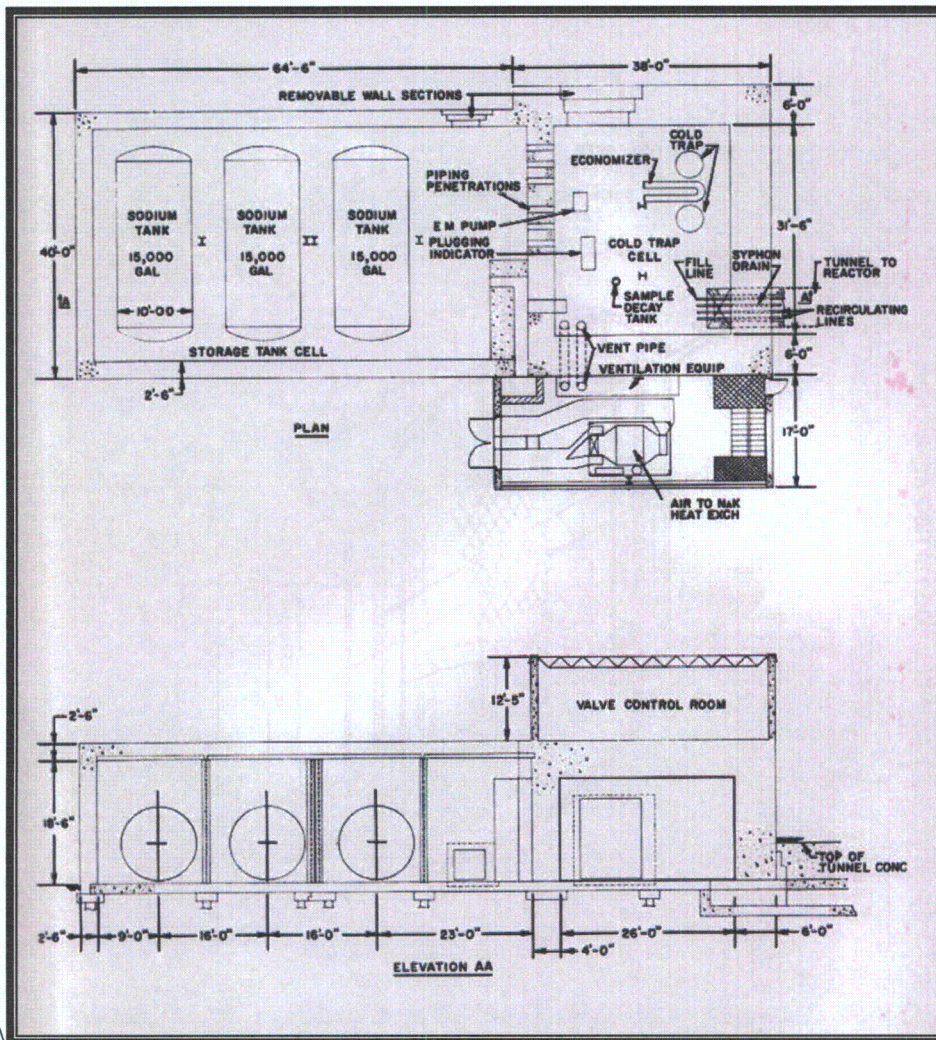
Plan and section of sodium storage and cold trap areas (Courtesy DECO)
